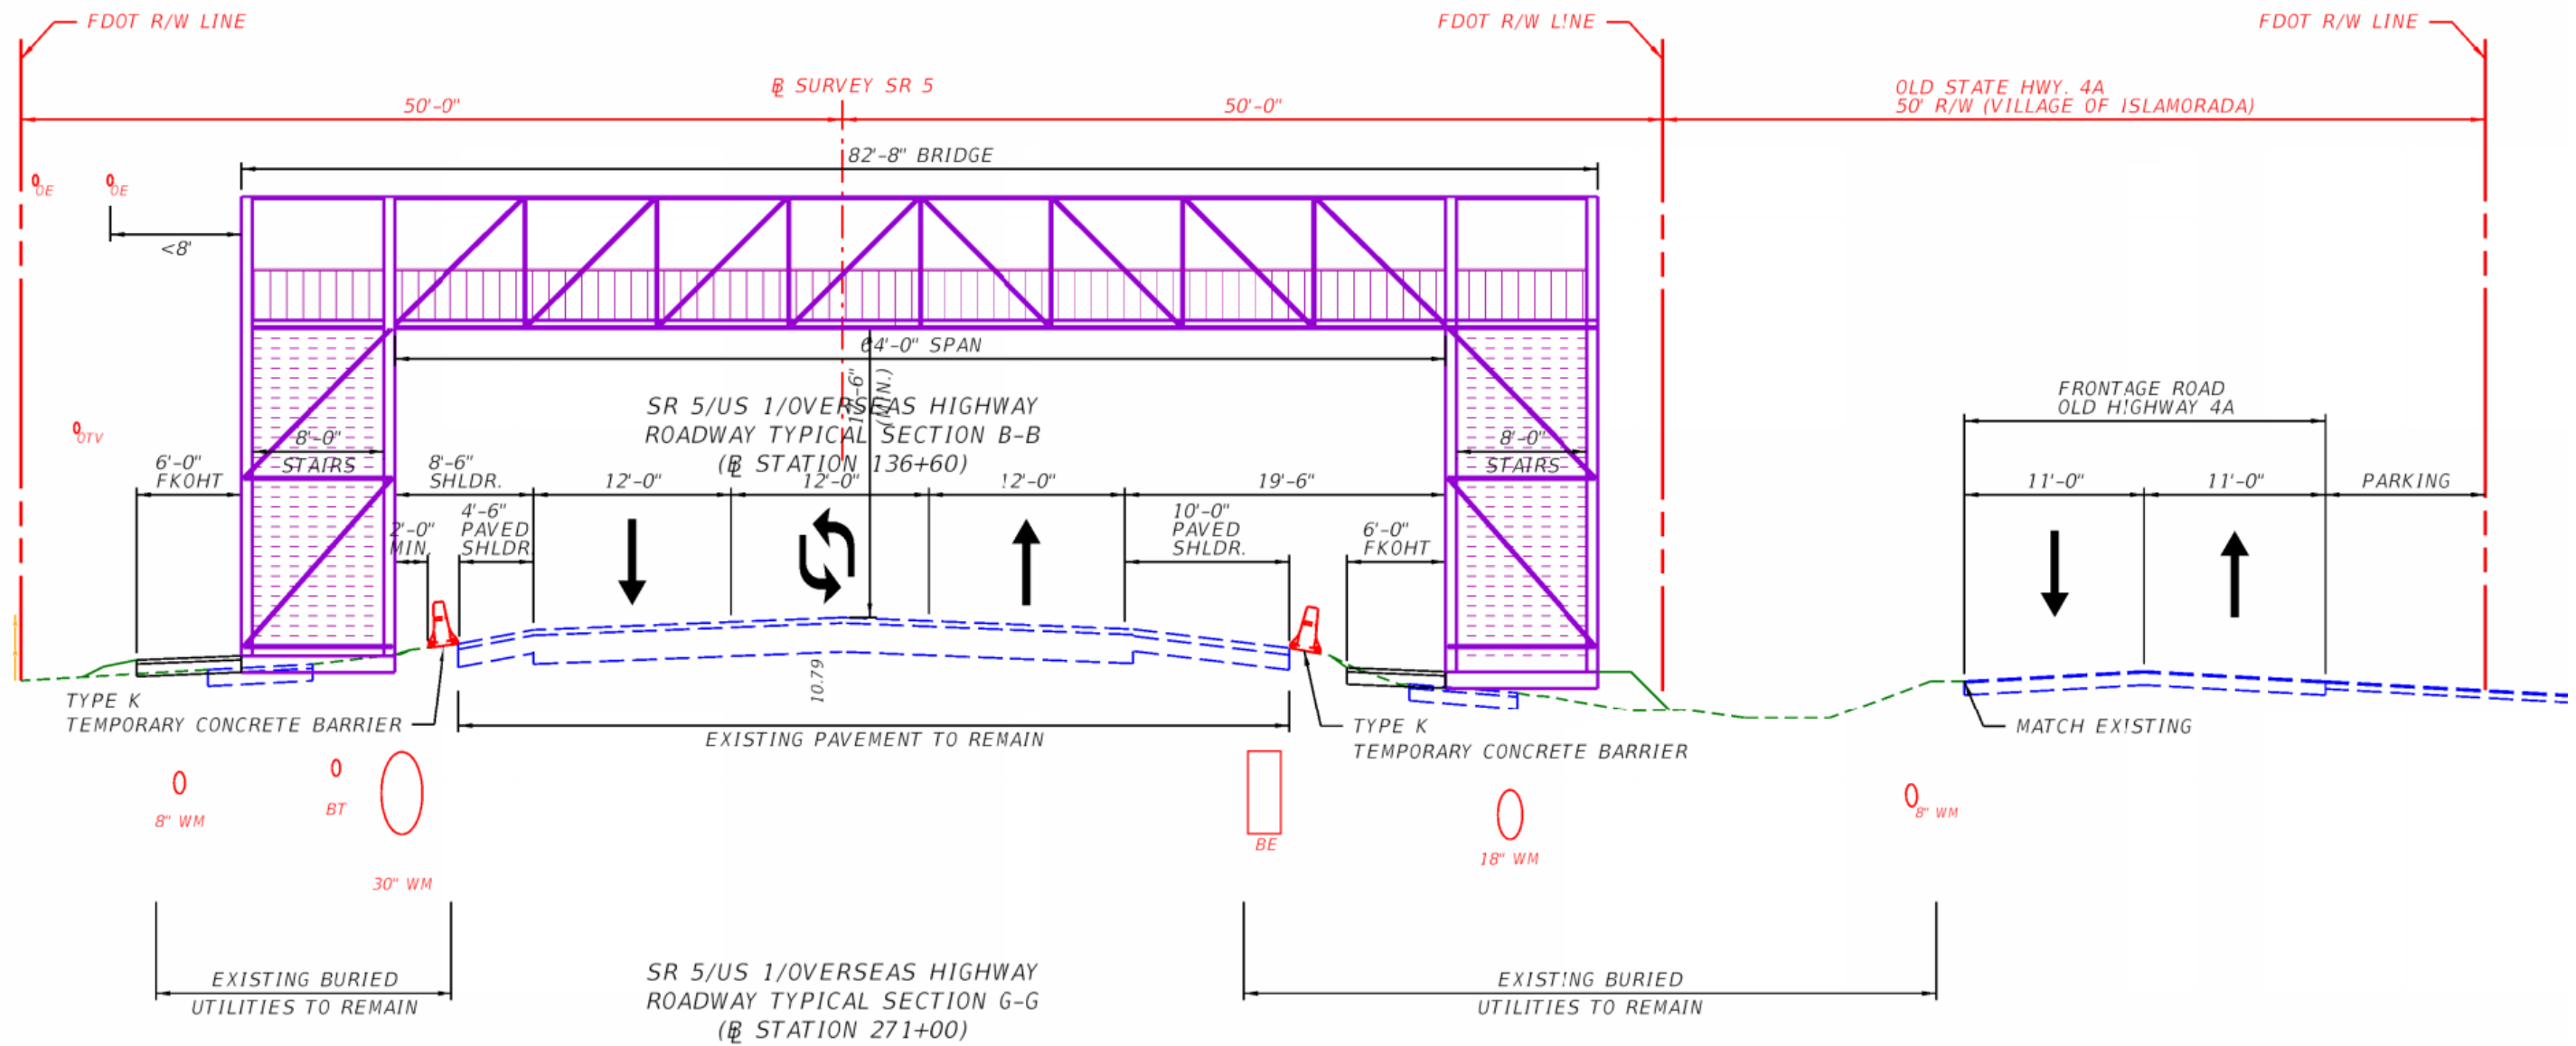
Location 4 Temporary Pedestrian Bridge Concept – Structural Plan & Elevation
